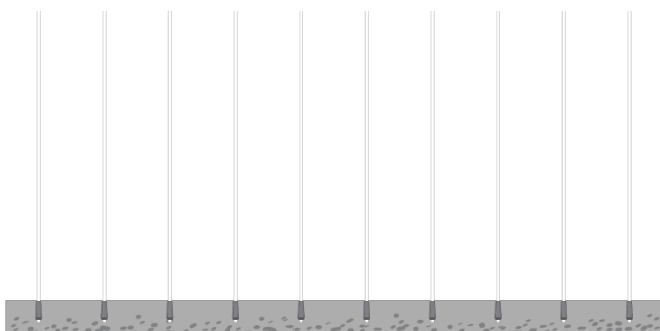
Threaded rod in concrete footing with anchors (not to scale)
